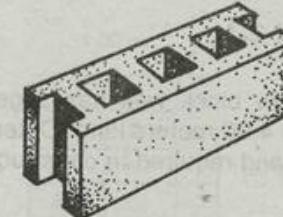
CONCRETE HOLLOW BLOCK
